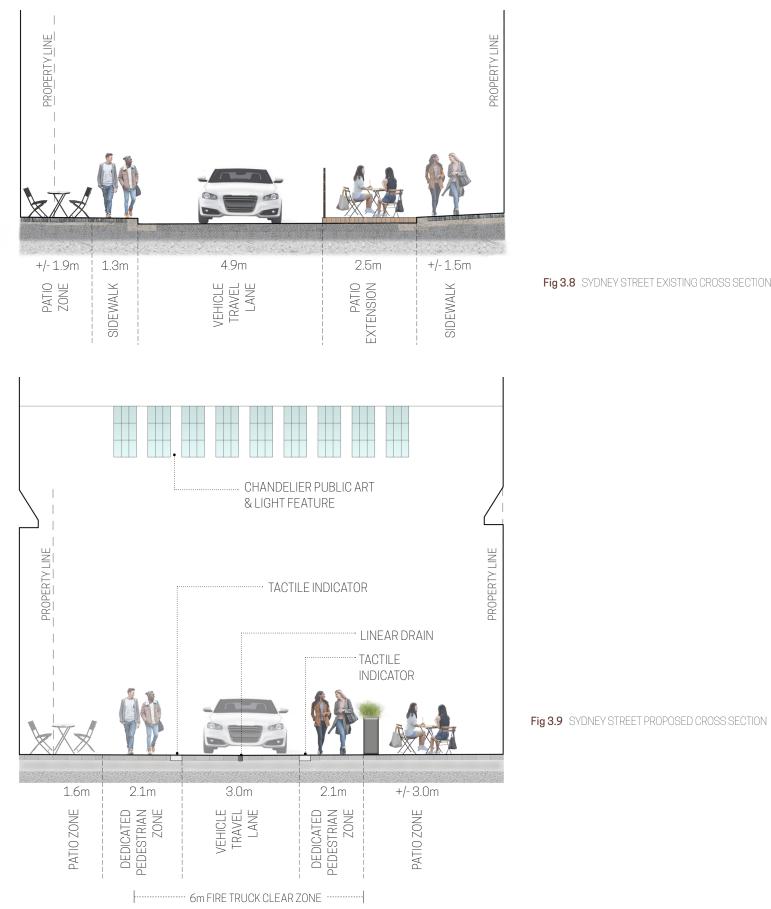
SYDNEY STREET EXISTING CROSS SECTION
